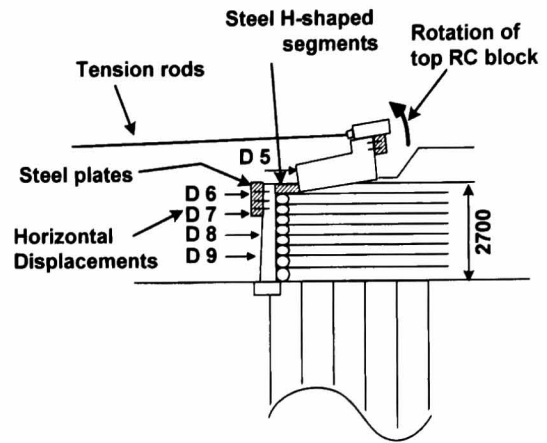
Schematic diagram of the movement of the top RC block on the abutment due to horizontal loading
